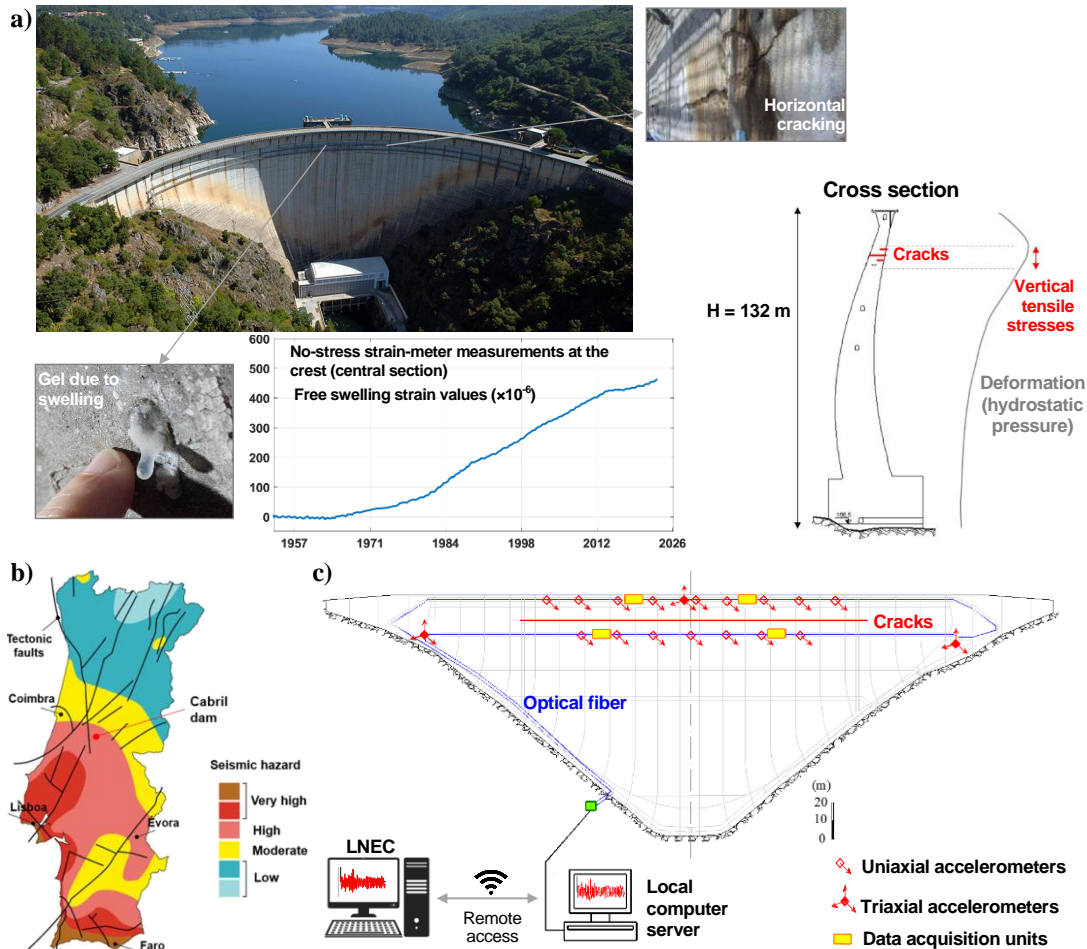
Cabril dam: a) aerial view and details of concrete swelling and horizontal cracking; b) location in the seismic hazard map of Portugal; c) SSSHM system installed in 2008.
